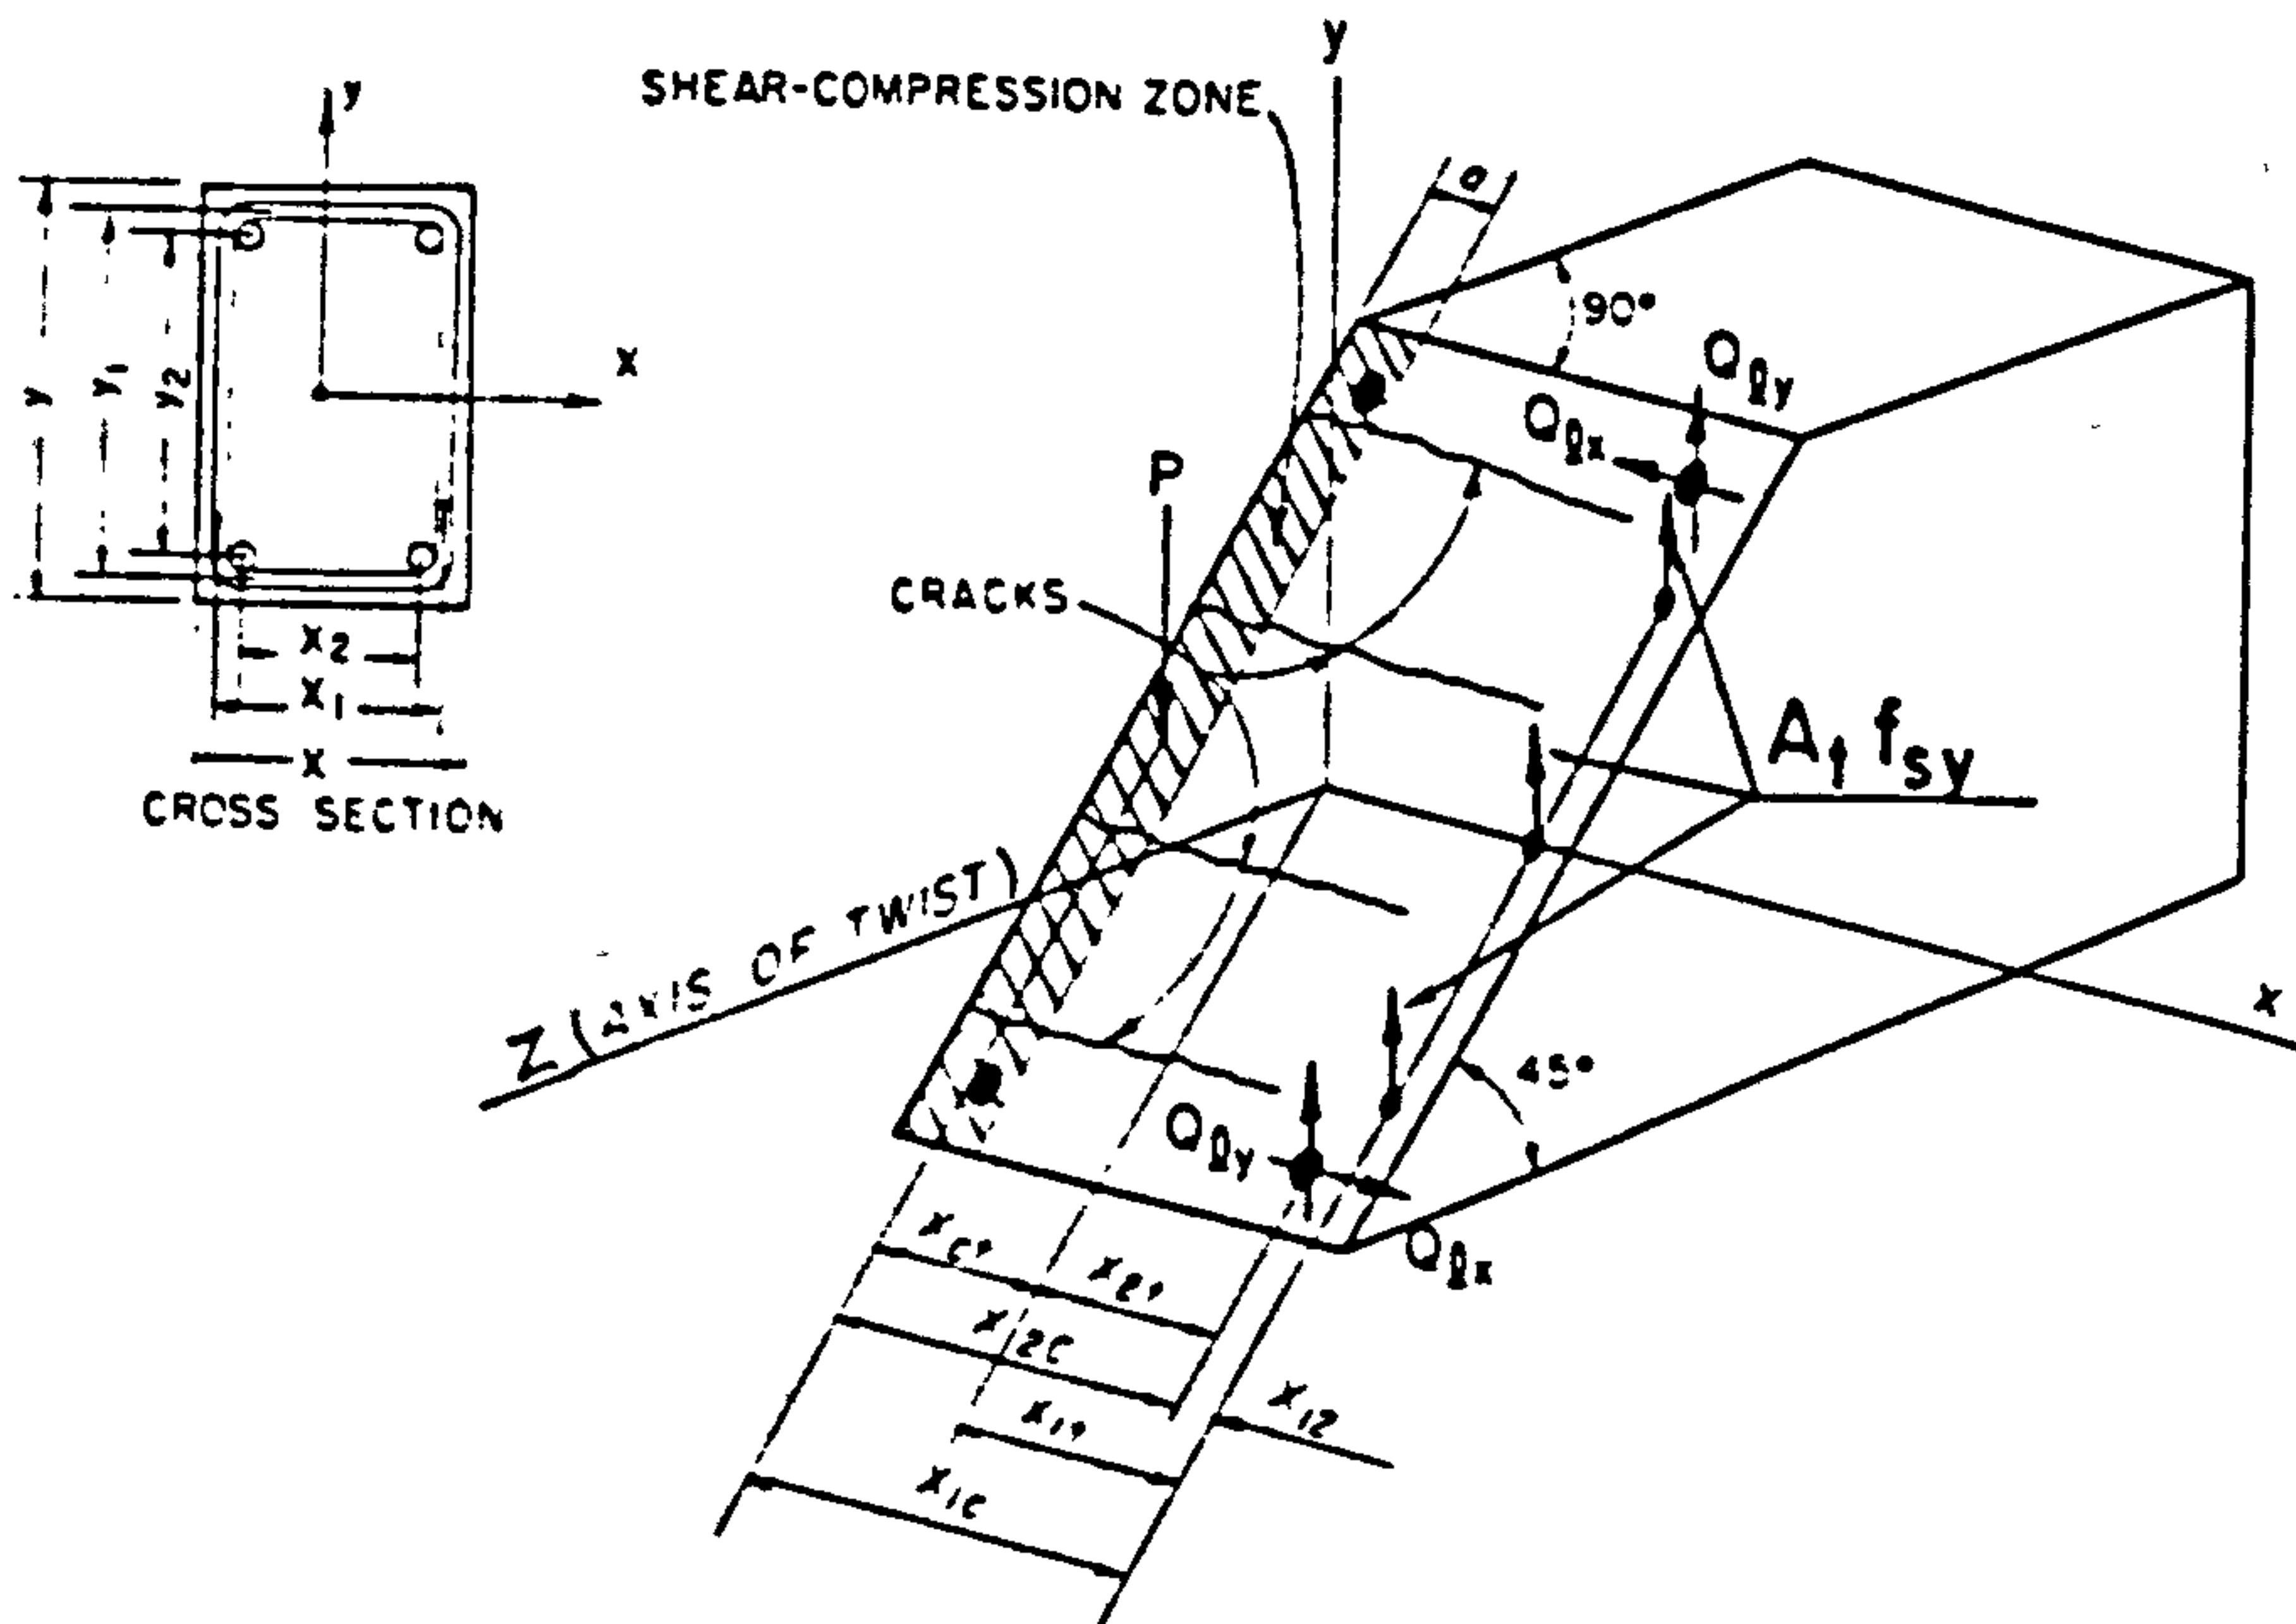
Skew failure plane for a rectangular reinforced concrete beam (Ref. 1).
